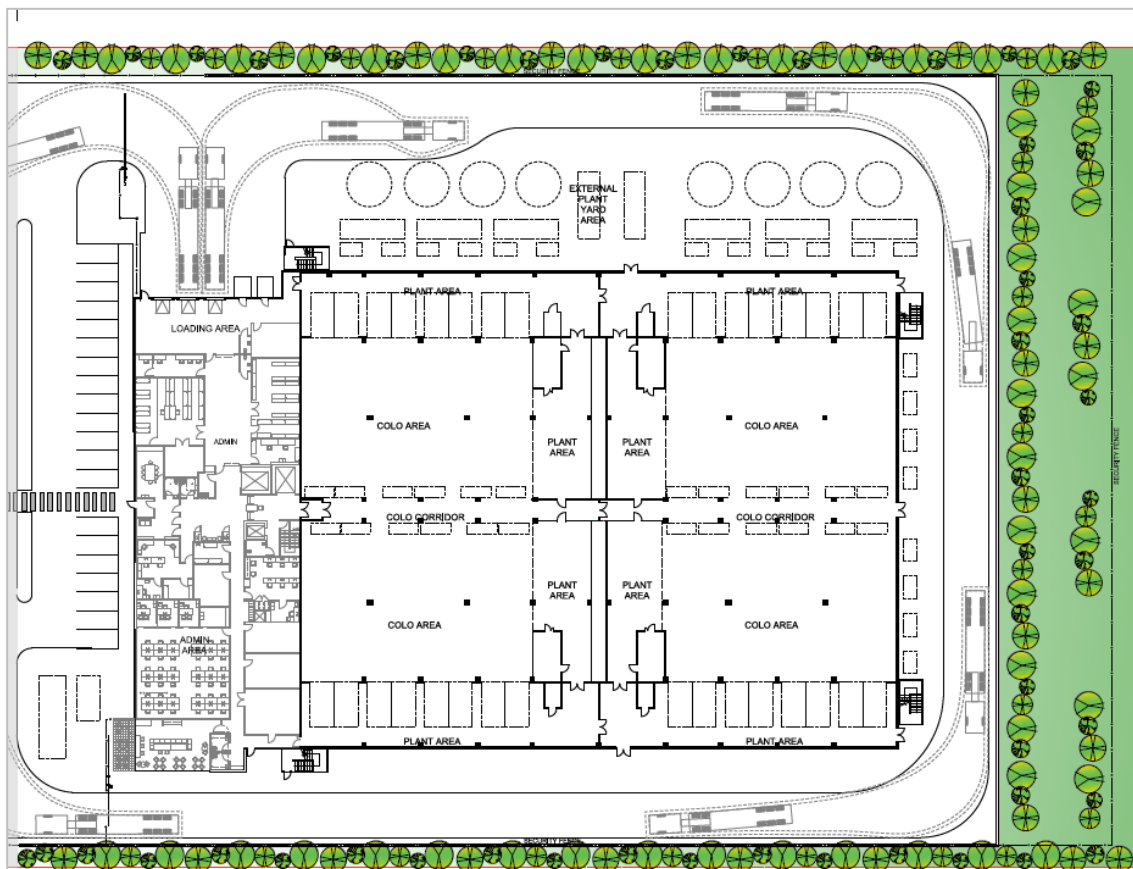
Site Plan Extract showing the footprint of the data storage premises proposed
